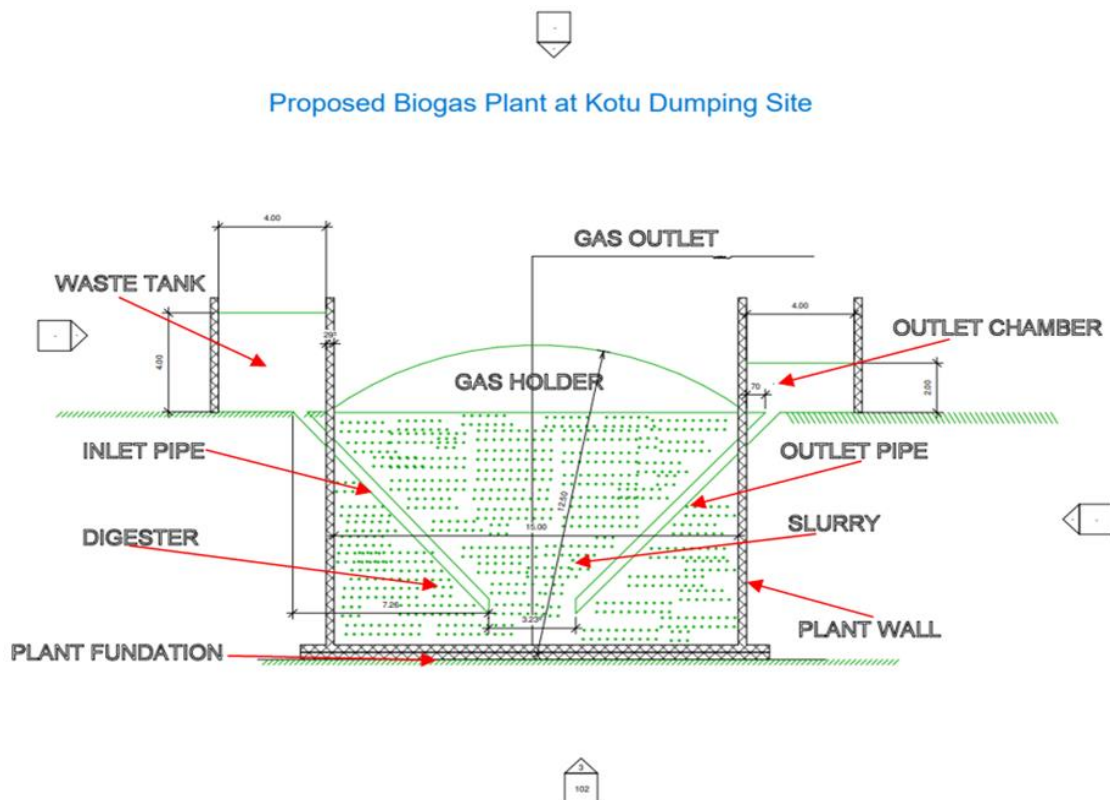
Biogas plant at the Manjai- Kotu dumping site
